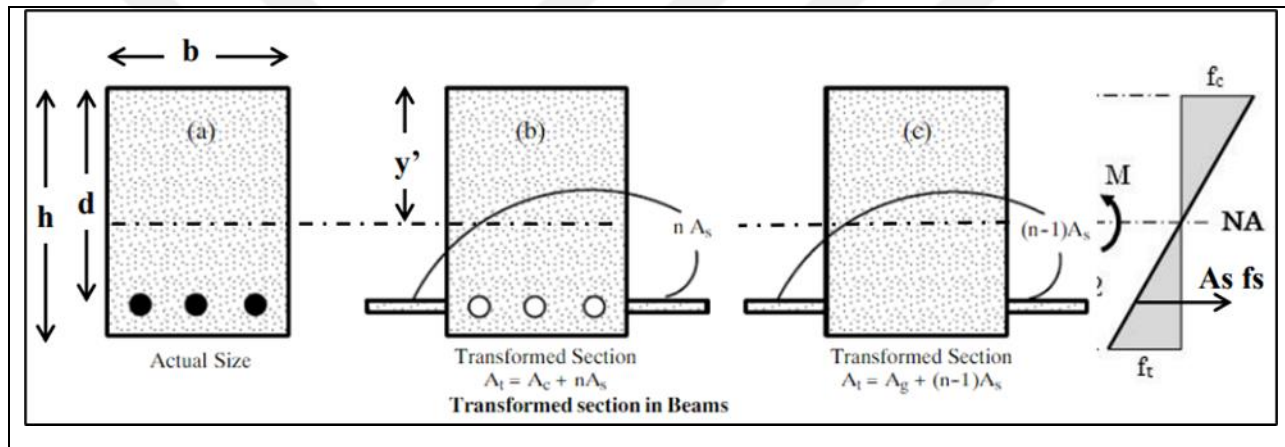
Compression and Tension Stress On The Beam Cross Section [47]
